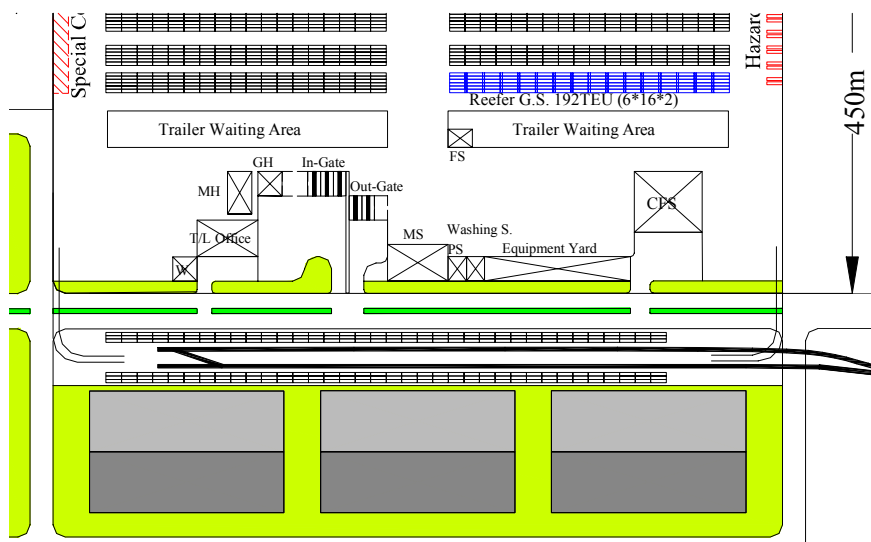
B-2 Container Terminal Layout (Future: In Case of Introducing Railway)
